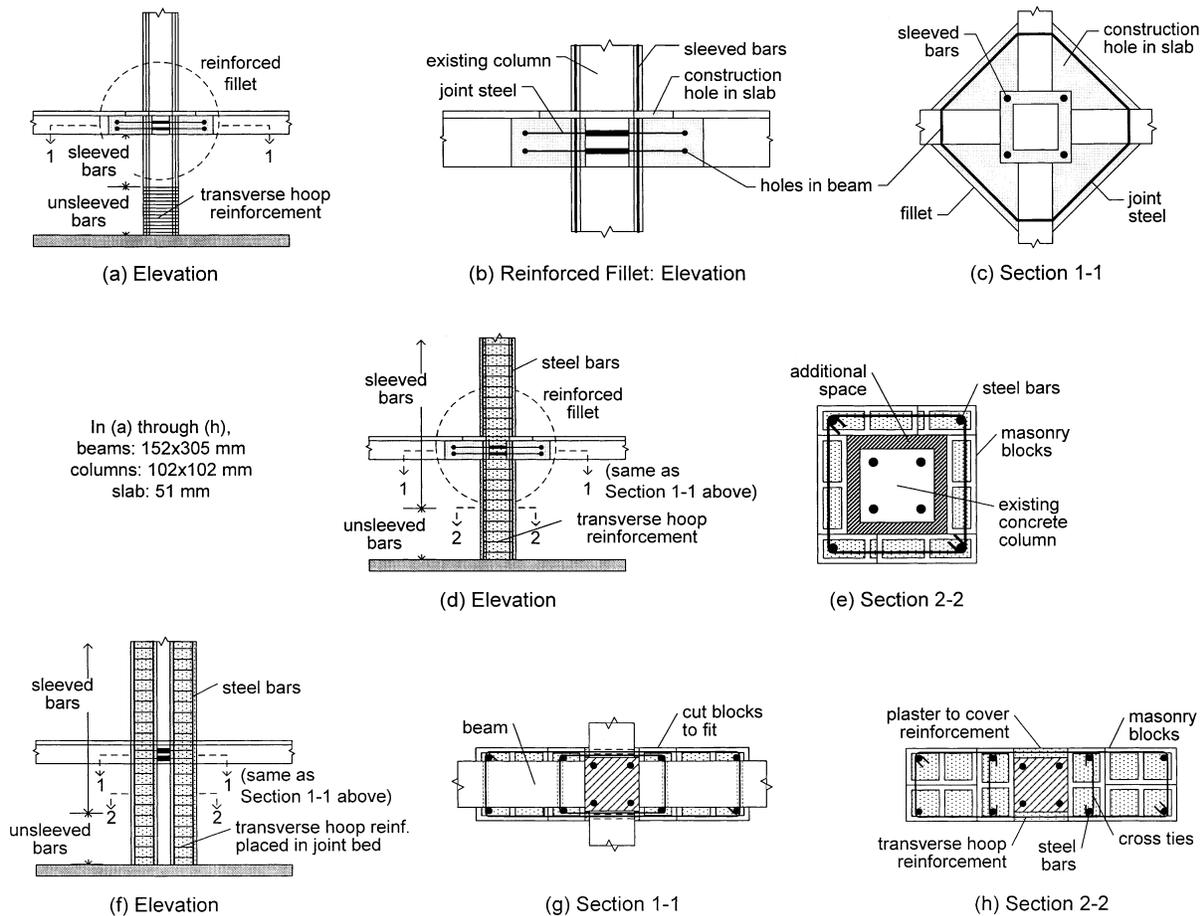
Retrofit techniques studied by Bracci, Reinhorn, and Mander:¹⁹ (a, b, and c) prestressed concrete jacketing; (d and e) masonry block jacketing; and (f, g, and h) partial masonry infill.
